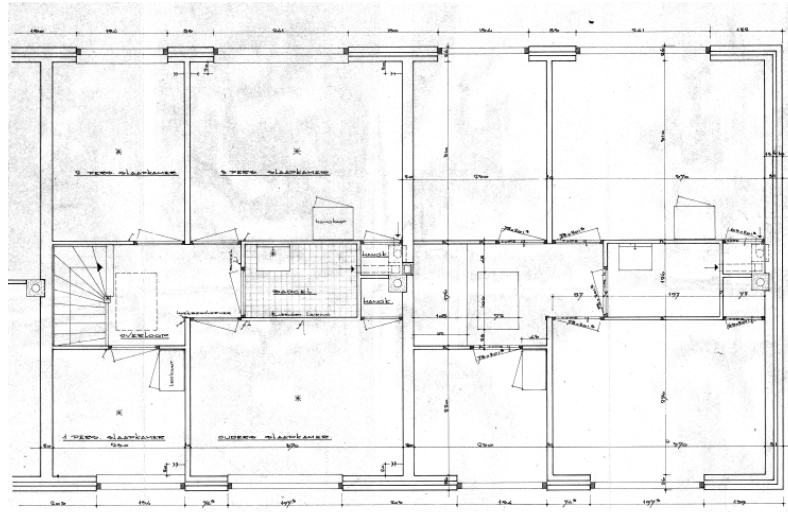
FIRST FLOOR PLAN - SINGLE TERRACED HOUSE
